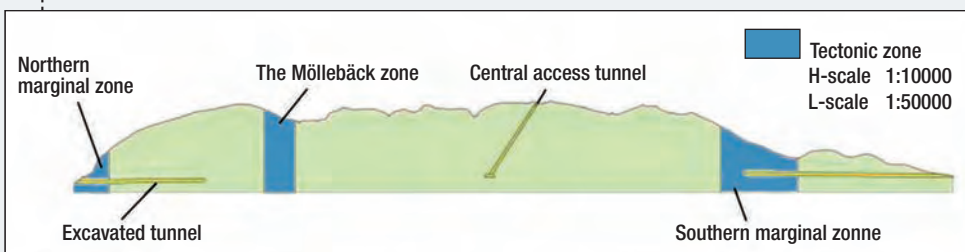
Schematic geological profile of the Hallandsås ridge with in 1997 already excavated tunnel sections.
